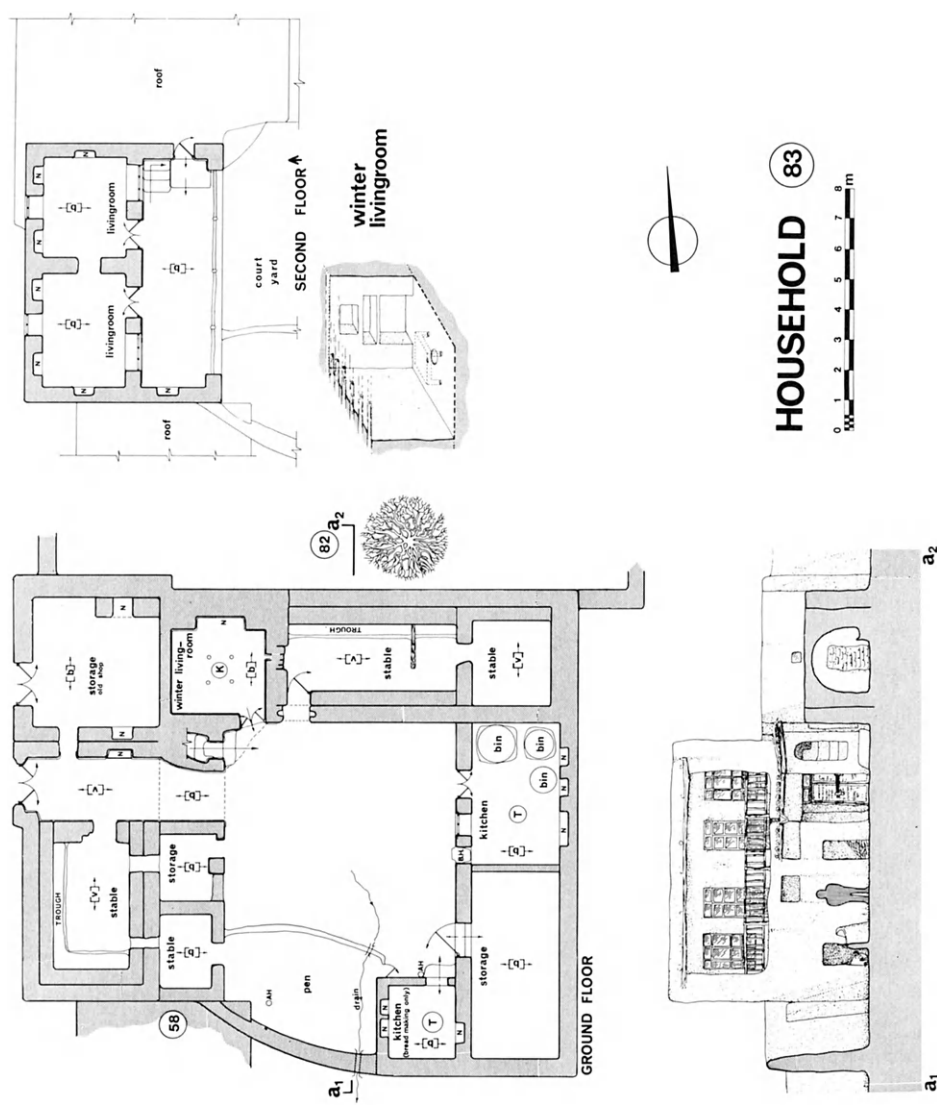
House 83, Aliabad (plan and section). T: oven, N: niche, K: hearth, AH: air hole, BH: beehive, b: horizontal ceiling, v: vaulted ceiling.
